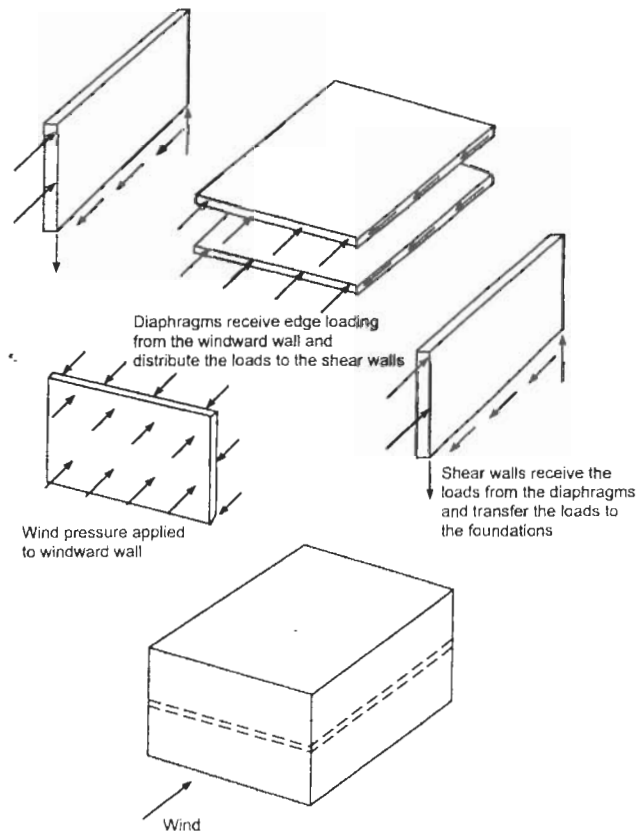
Propagation of Wind Forces in a Concrete Building
